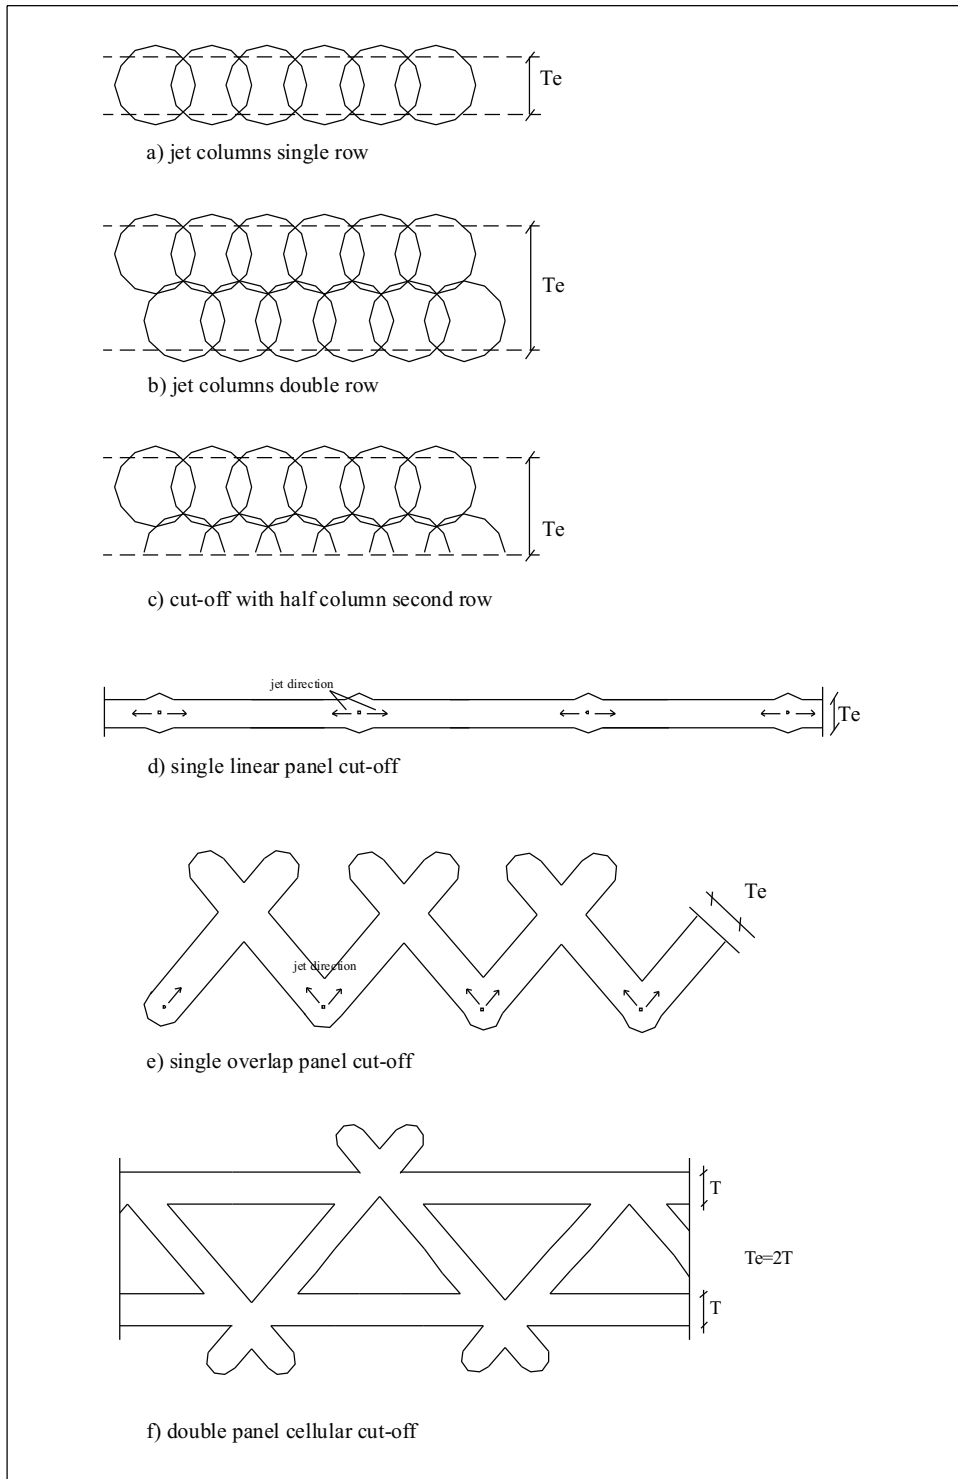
Typical jet (soilcrete) columns and jet panel layout
